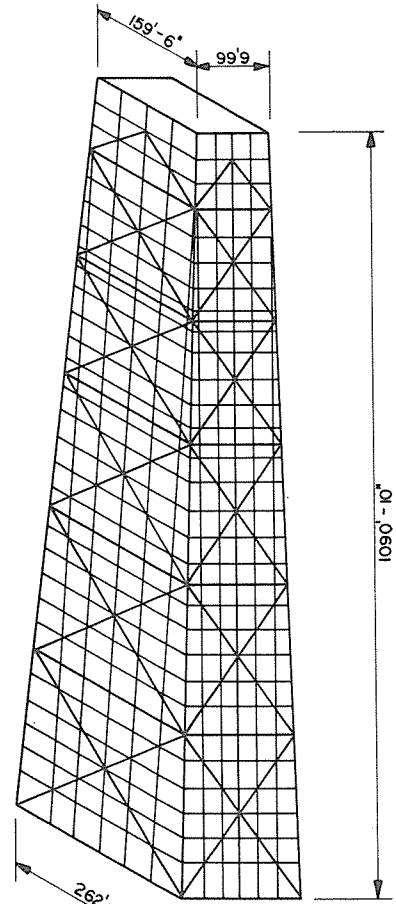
Diagonally braced truss tube structure from bottom to top of building
